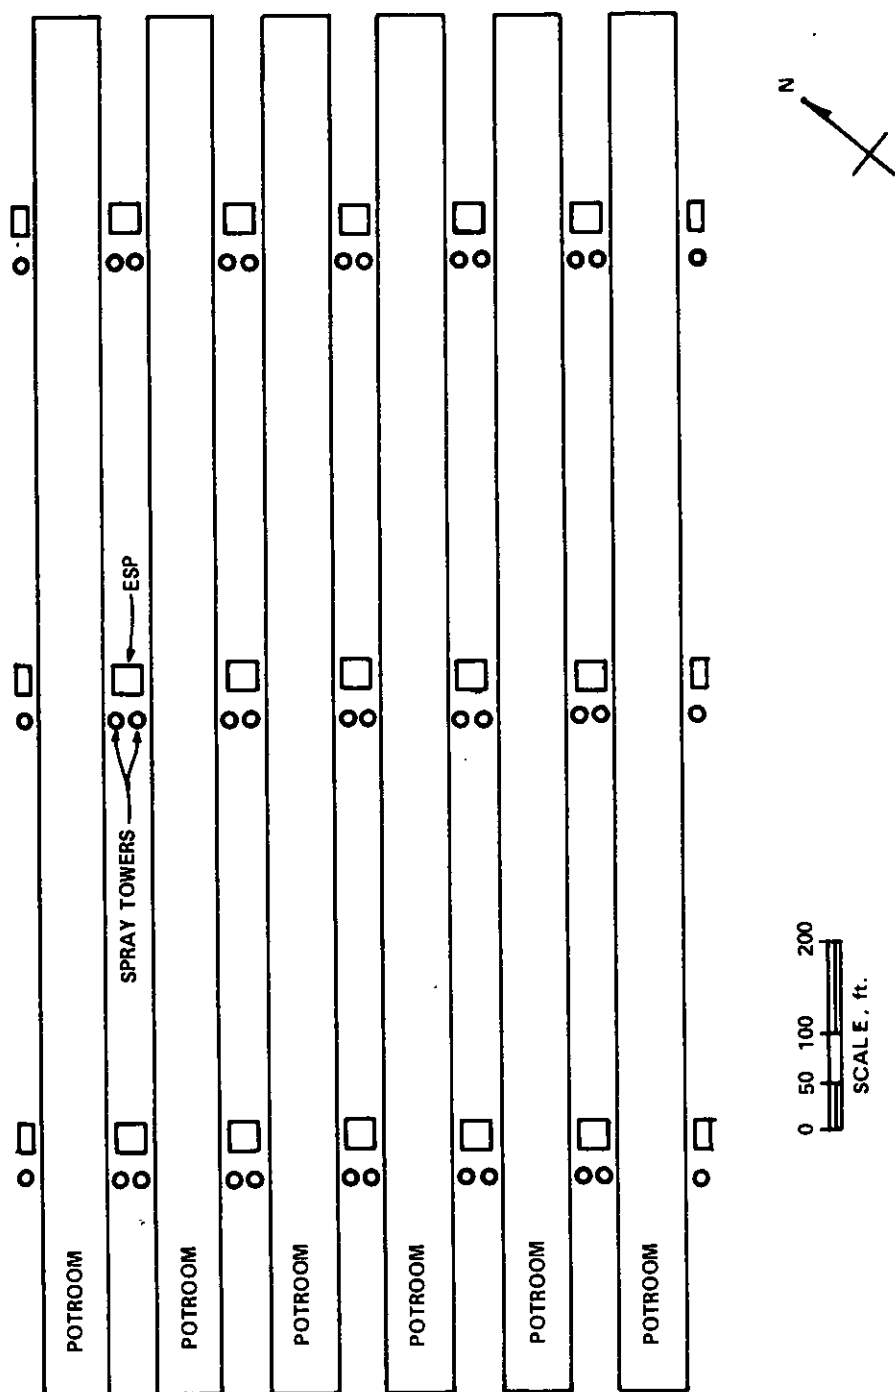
Retrofit layout -- plant B -- north plant (location and position of control equipment not exact).
